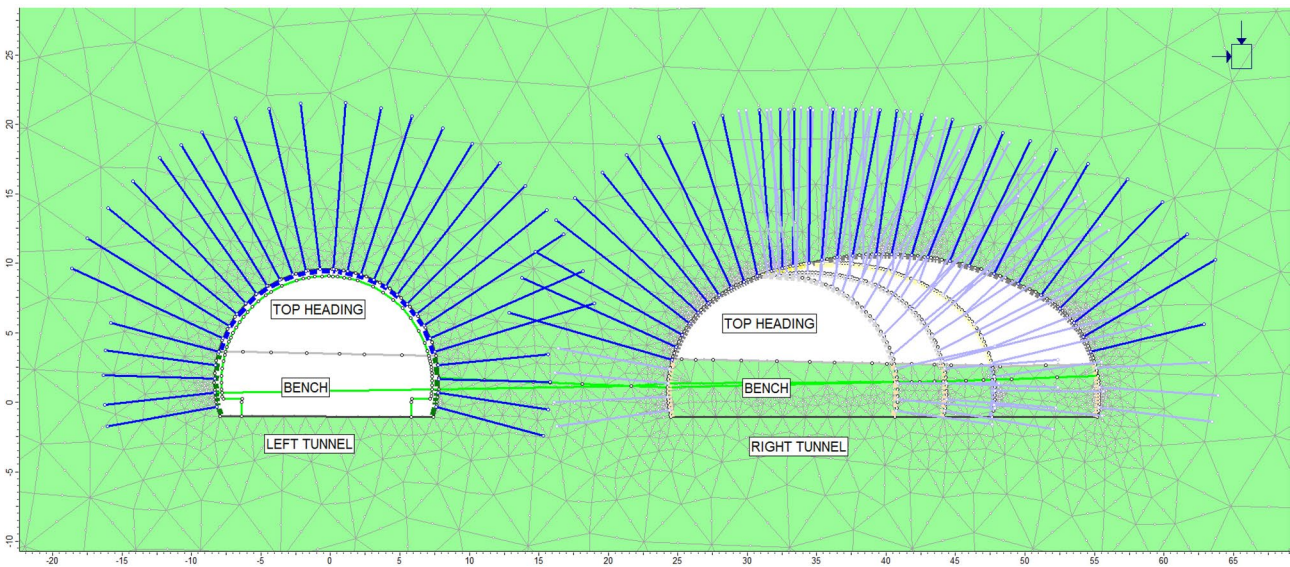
Top heading section of right tunnel; stage 13, installation of tunnel support systems
